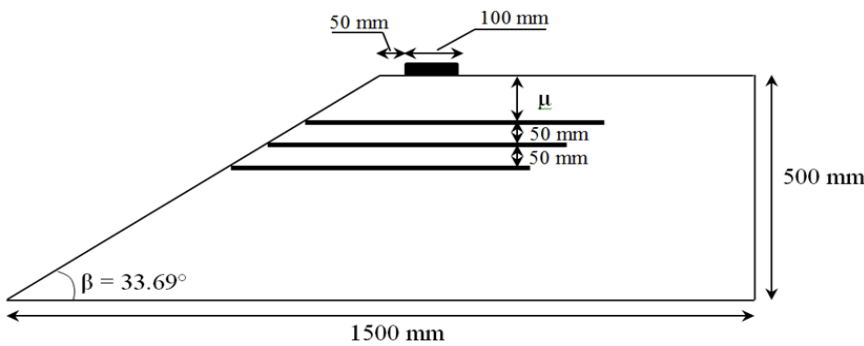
Cross section of model test in the case of reinforced ground by geotextiles.
